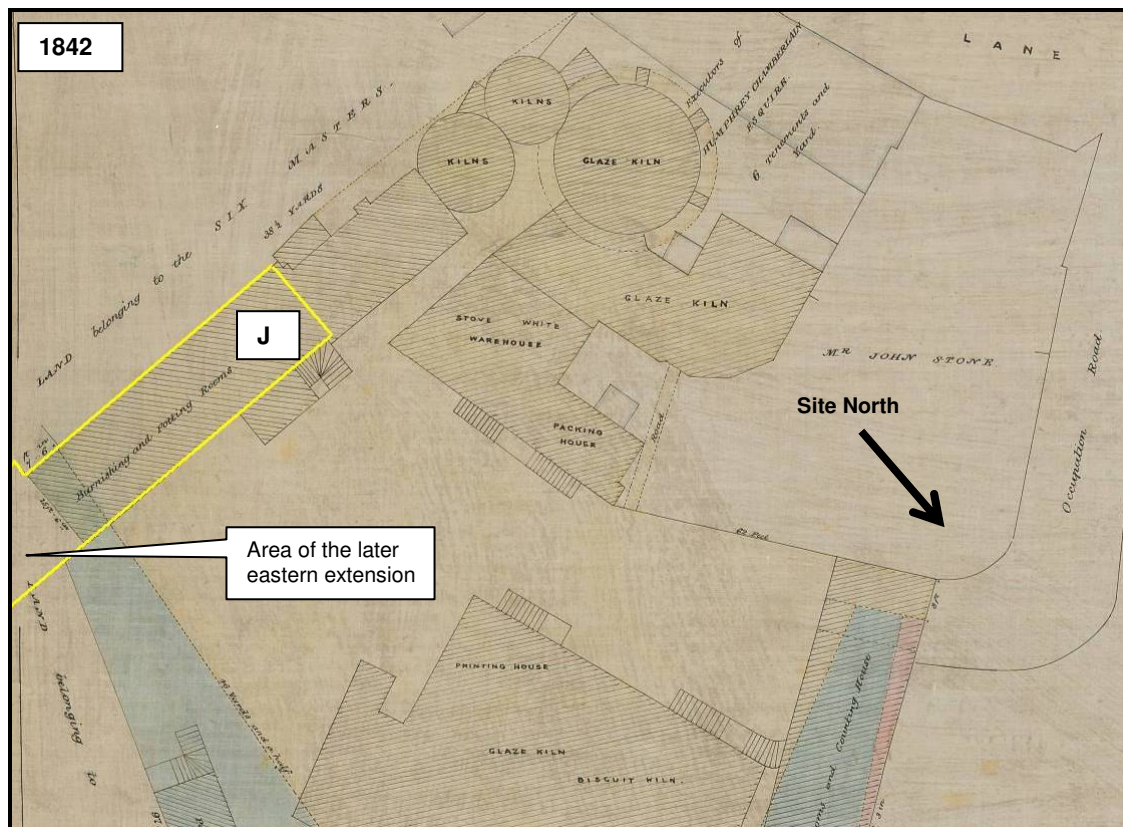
Plan of the Works in 1842, showing Building J before the eastern extension was built (WPM)
